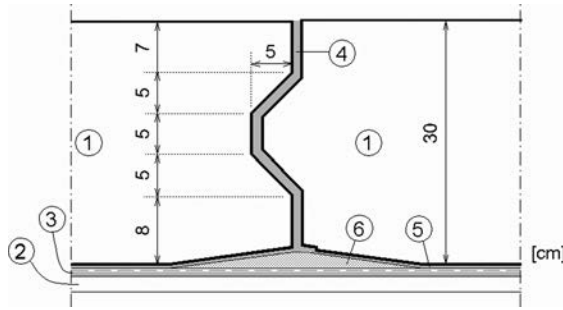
Bovilla dam, vertical joint between slabs (after Sembenelli & Sembenelli, 2013). (1) Concrete slabs; (2) lean concrete base layer; (3) waterproof element – geocomposite; (4) triple-layer geotextile; (5) single-layer geotextile; (6) foamed polystyrene wedge.
